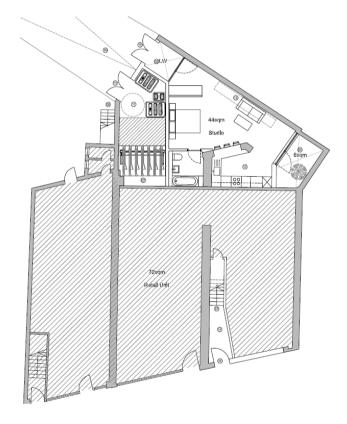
Proposed ground floor plan showing the retail space, residential unit and residential ancillaries.
